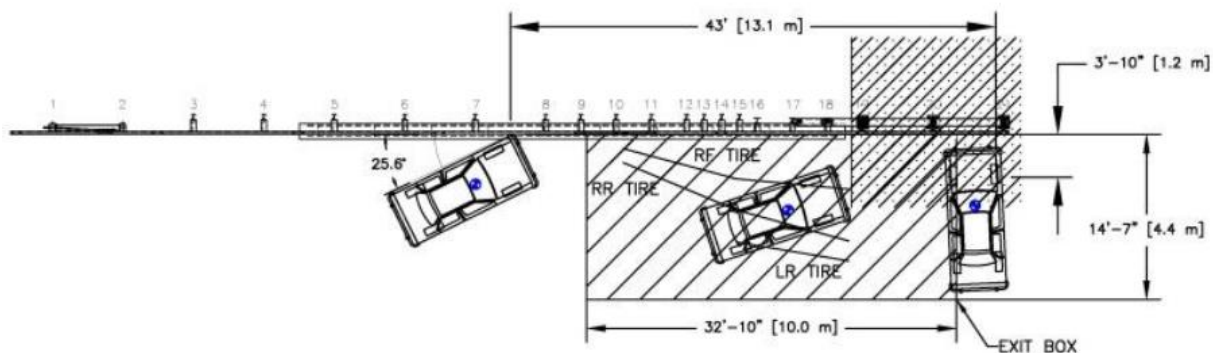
Test Impact Drawings for Test No. MWTC-2.
